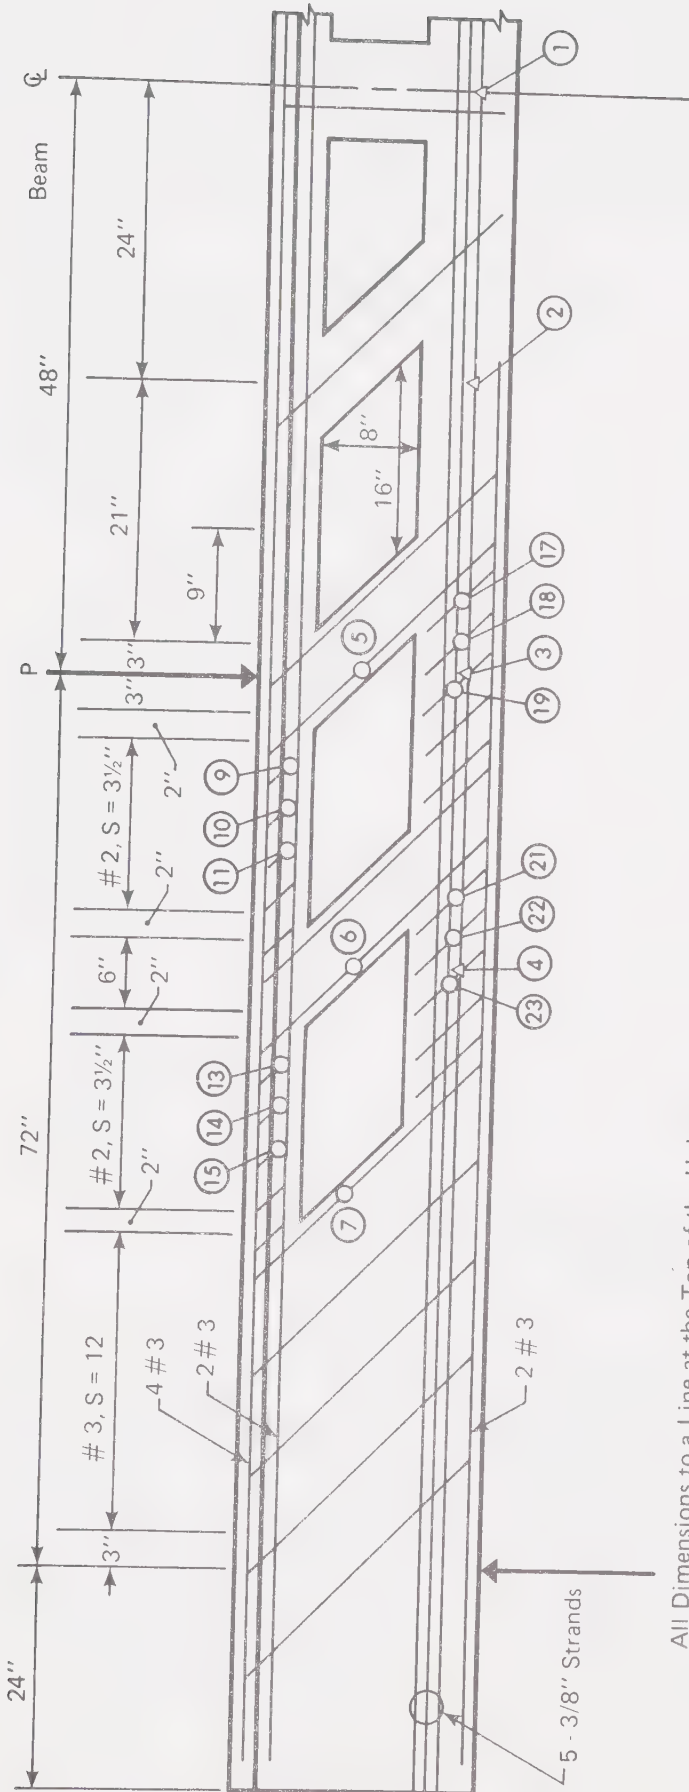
Reinforcement Details and Strain Gage Locations for Beam 13-16-6-P
